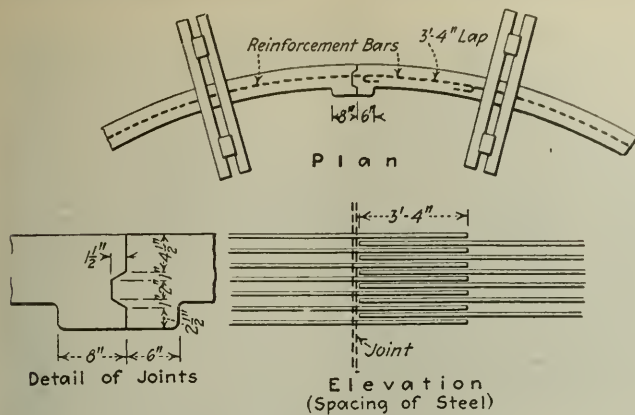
CONSTRUCTION CUT IN BIN WALLS
